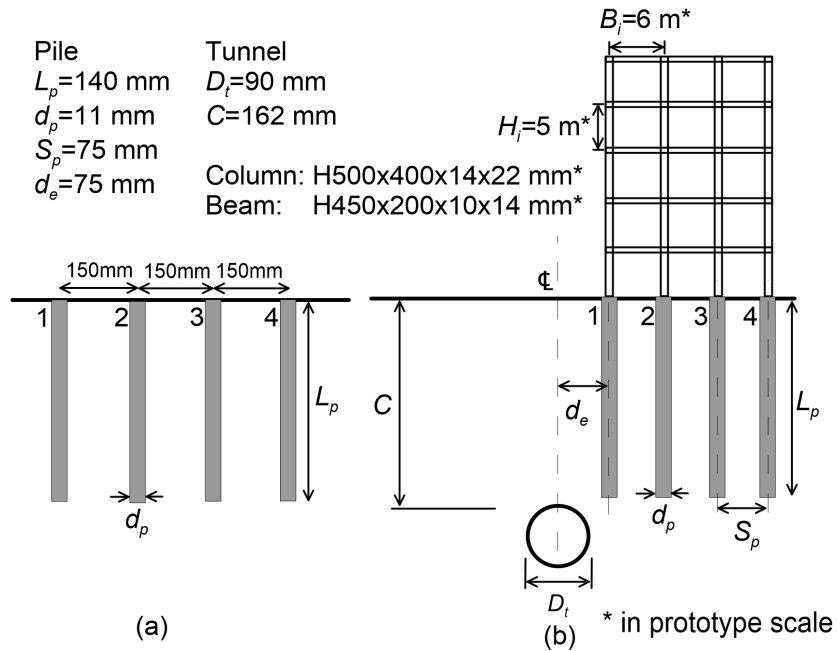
Test layout in model scale: (a) pile jacking test, and (b) tunnelling next to piled structure
